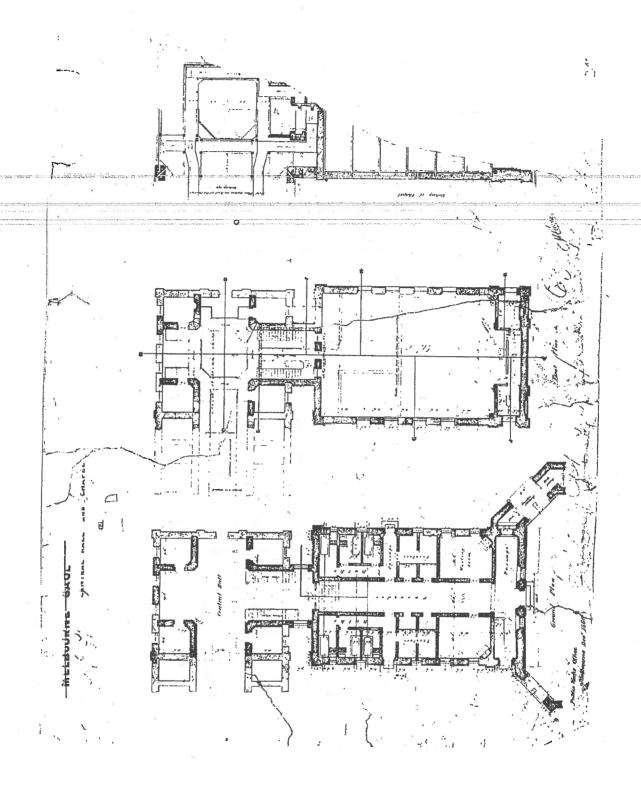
"Melbourne Gaol Central Hall and Chapel" Floor Plans and part Ceiling Plan, 1860
